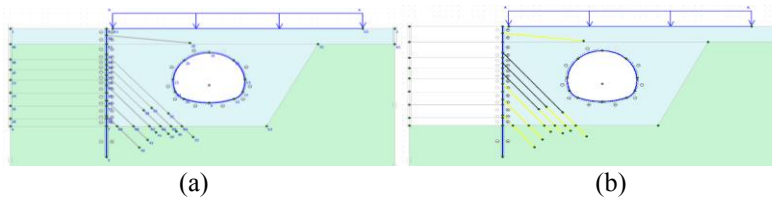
Construction Stages, (a) the first stage, (b) the 16th stage.
